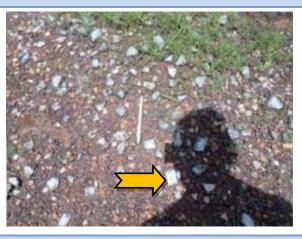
Section 32 – Area E1, external, north central area, debris – asbestos fibre cement sheet. Reference: 17069-001-028.
